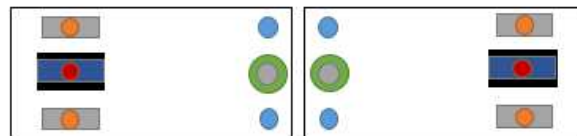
C1-1 column - Arrangement of reinforcements in cross section [1]
